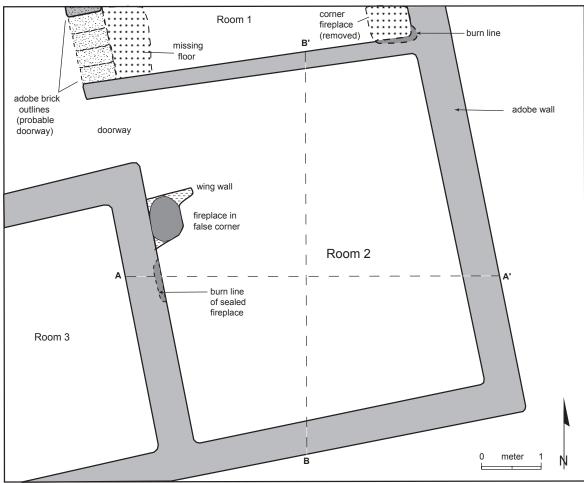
Plan of Room 2, Structure 1 at the Trujillo House.
